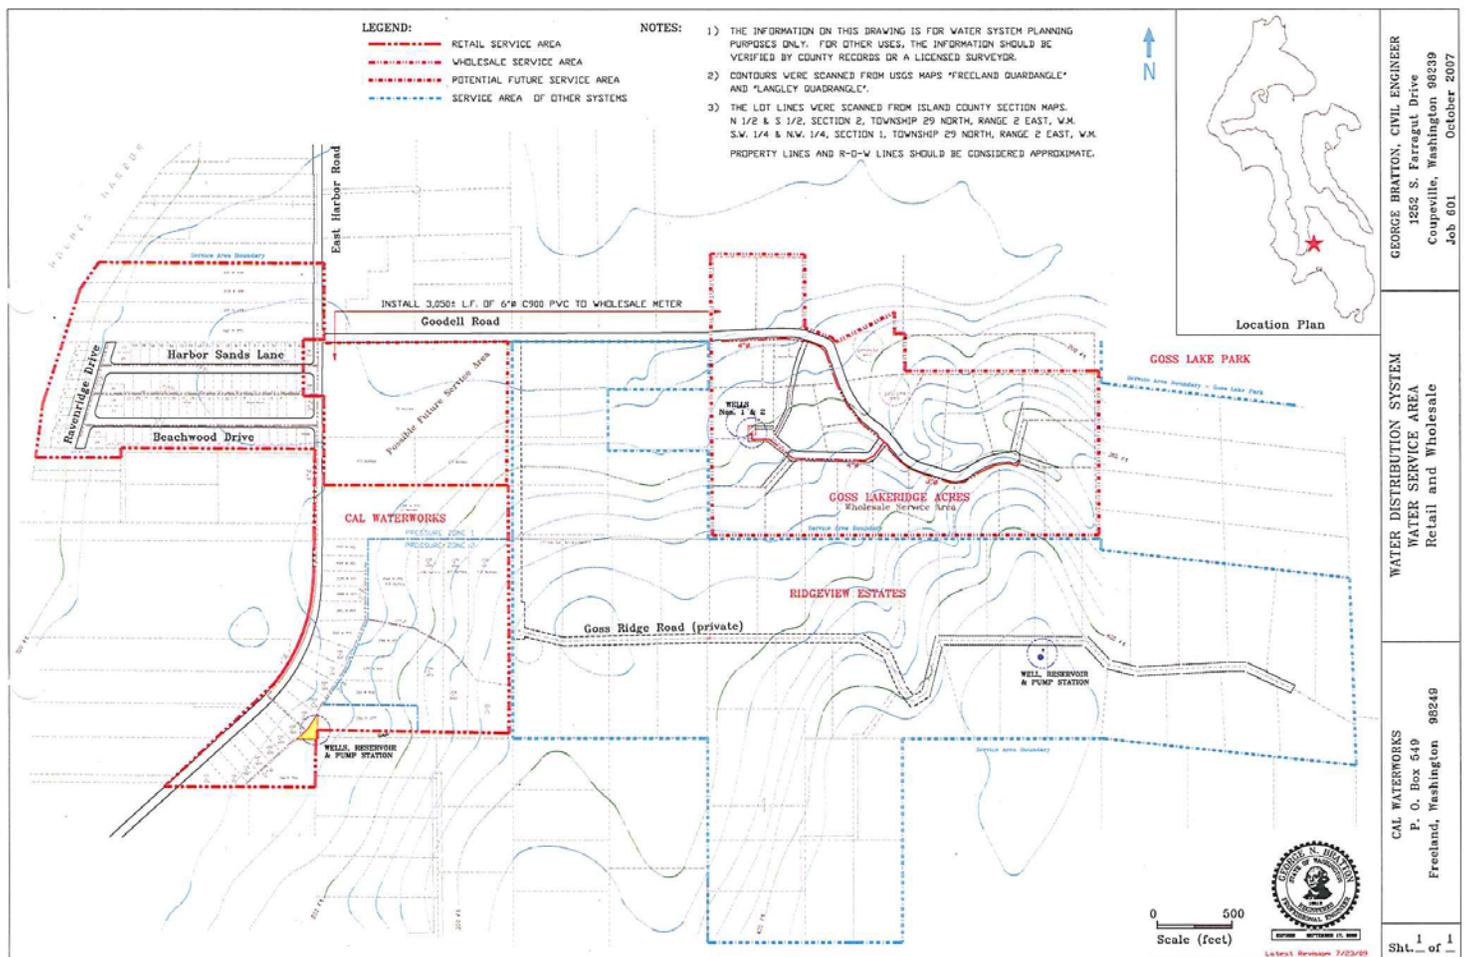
CAL Waterworks and Goss Lakeridge service areas, well locations, and proposed connection line
